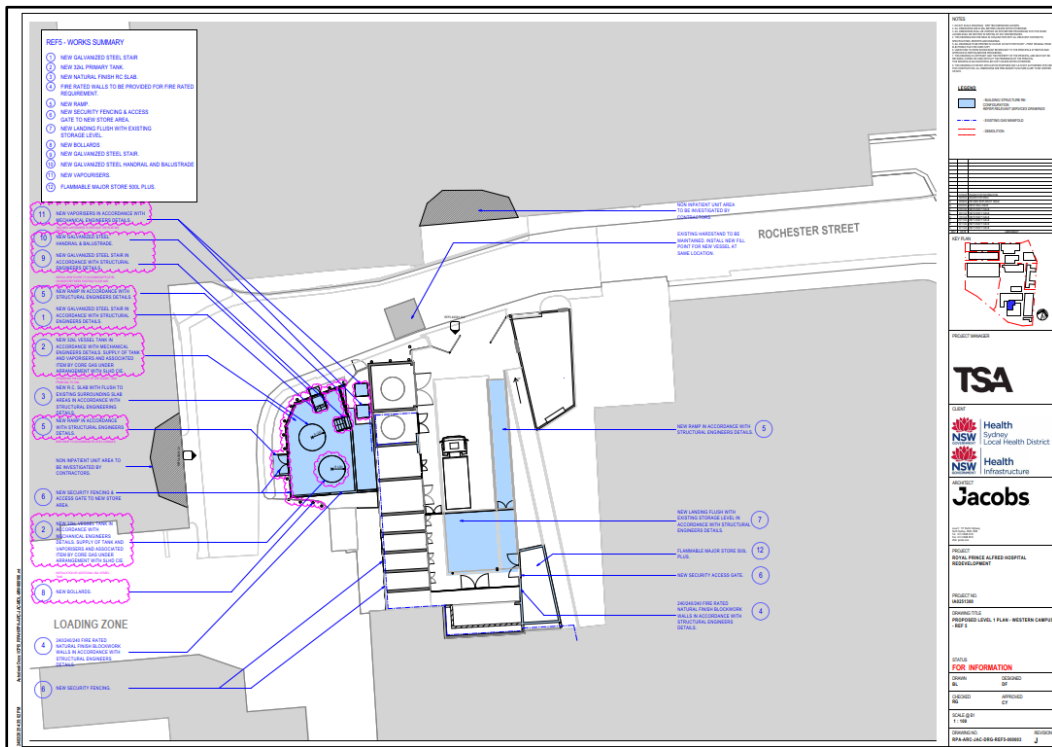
Proposed Level 1 Plan – Western Campus – REF 5
